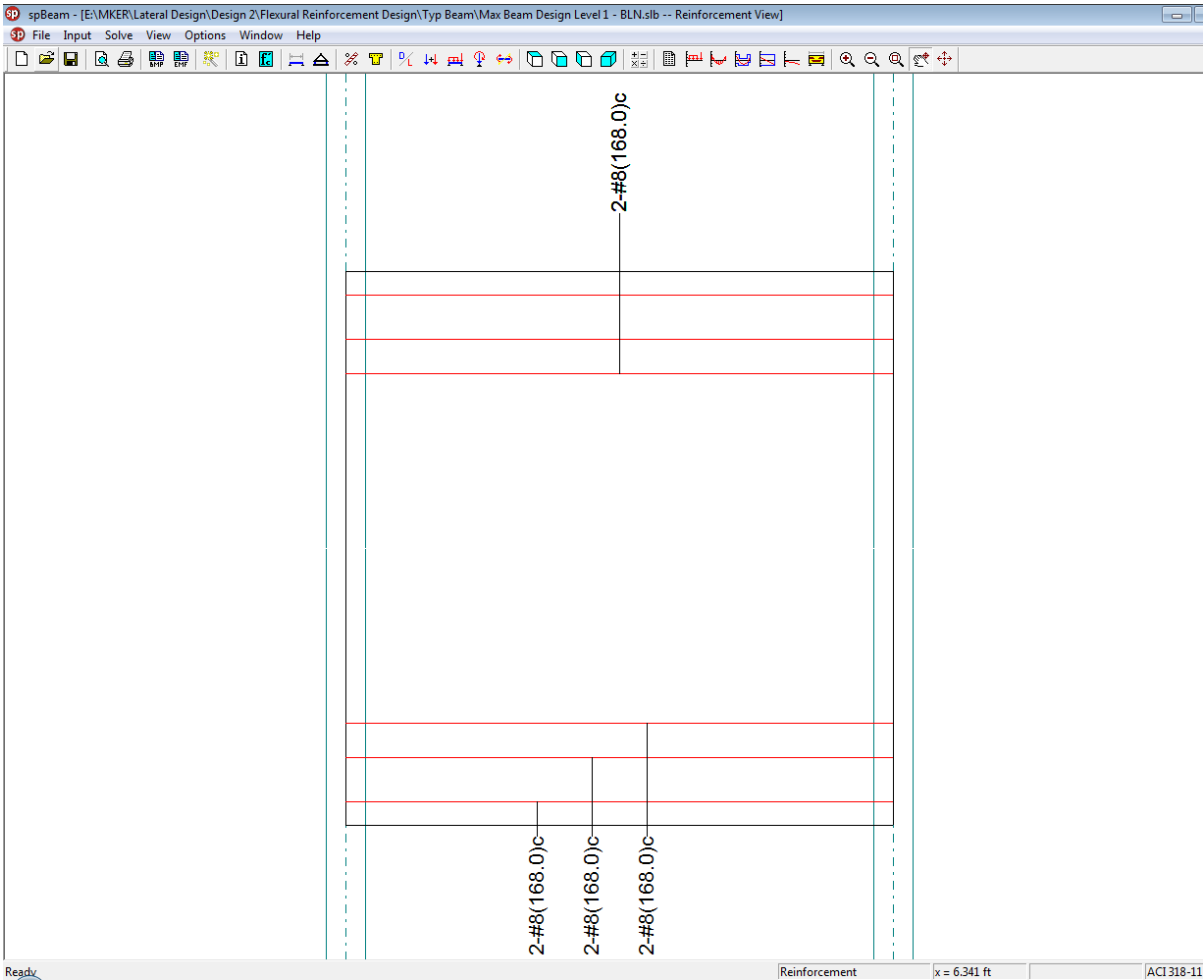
, spBeam Flexural Reinforcement Design of BLN Lvl. 1
